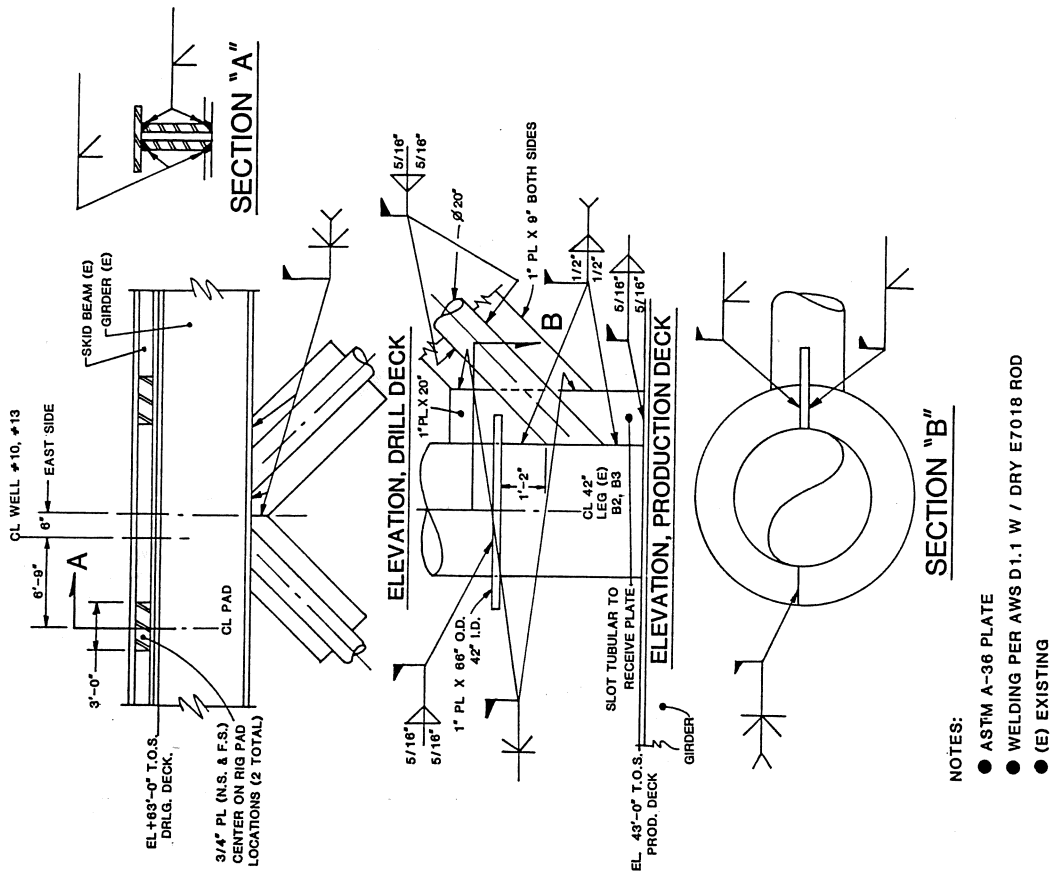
P-0203 No. H-13 reinforcing, Platform Gina—Truss B, east side.
